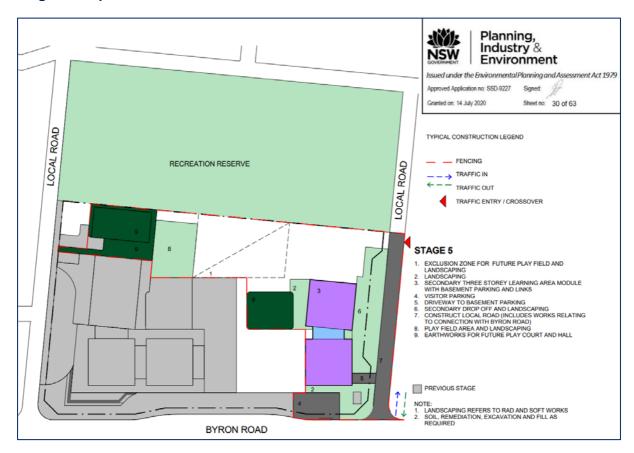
| Stage 5 site plan – as approved (Source: SSD-9227 Approved Plans)
